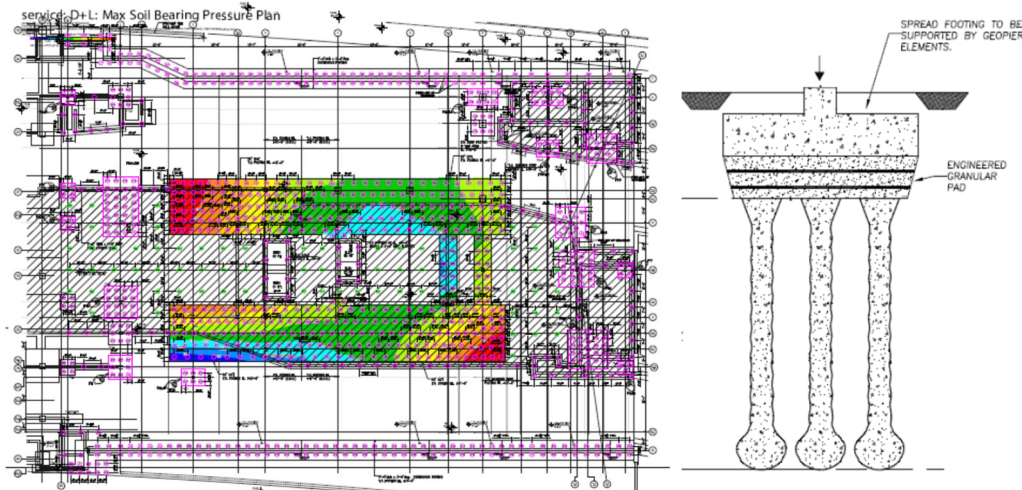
(a) Rigid inclusion layout; (b) Typical footing pad detail
